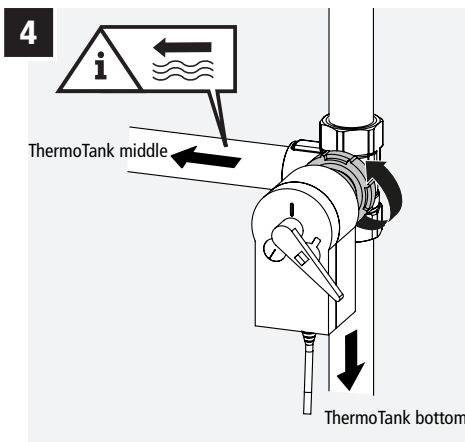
Turn the lock by um 45° to fix the actuator on the valve.
